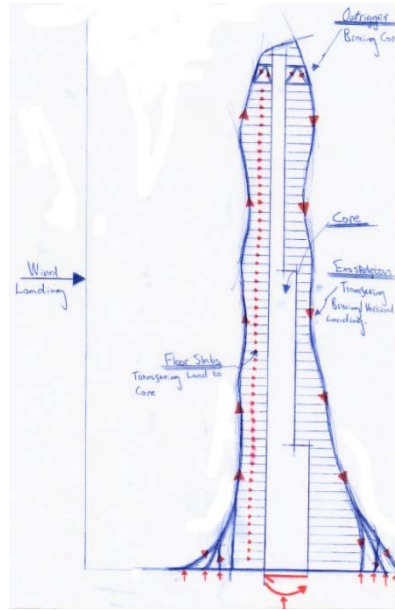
Braced outrigger structural concept adopted for the Bionic Tower
